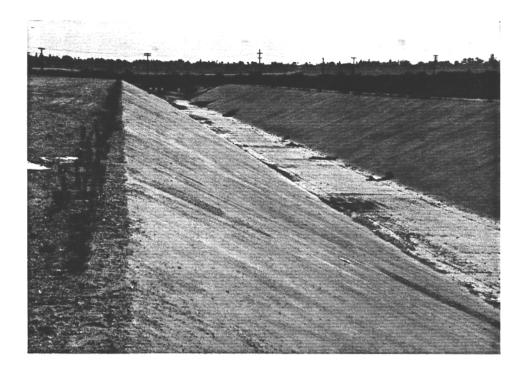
Devil Creek Diversion Structure Looking Downstream (SW) From 3RD Avenue Extension.
